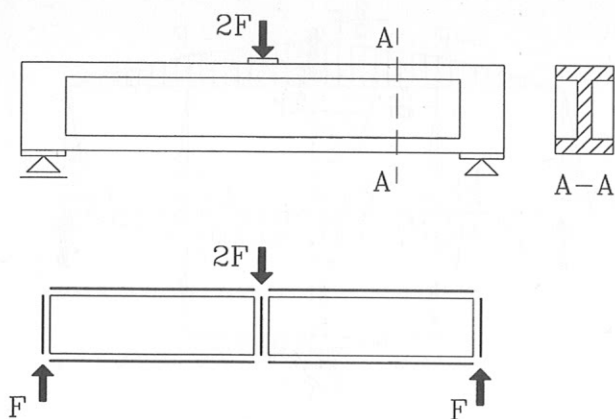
Example of beam with I-shaped cross section modeled with stringers and panels; positions of stringers obvious
